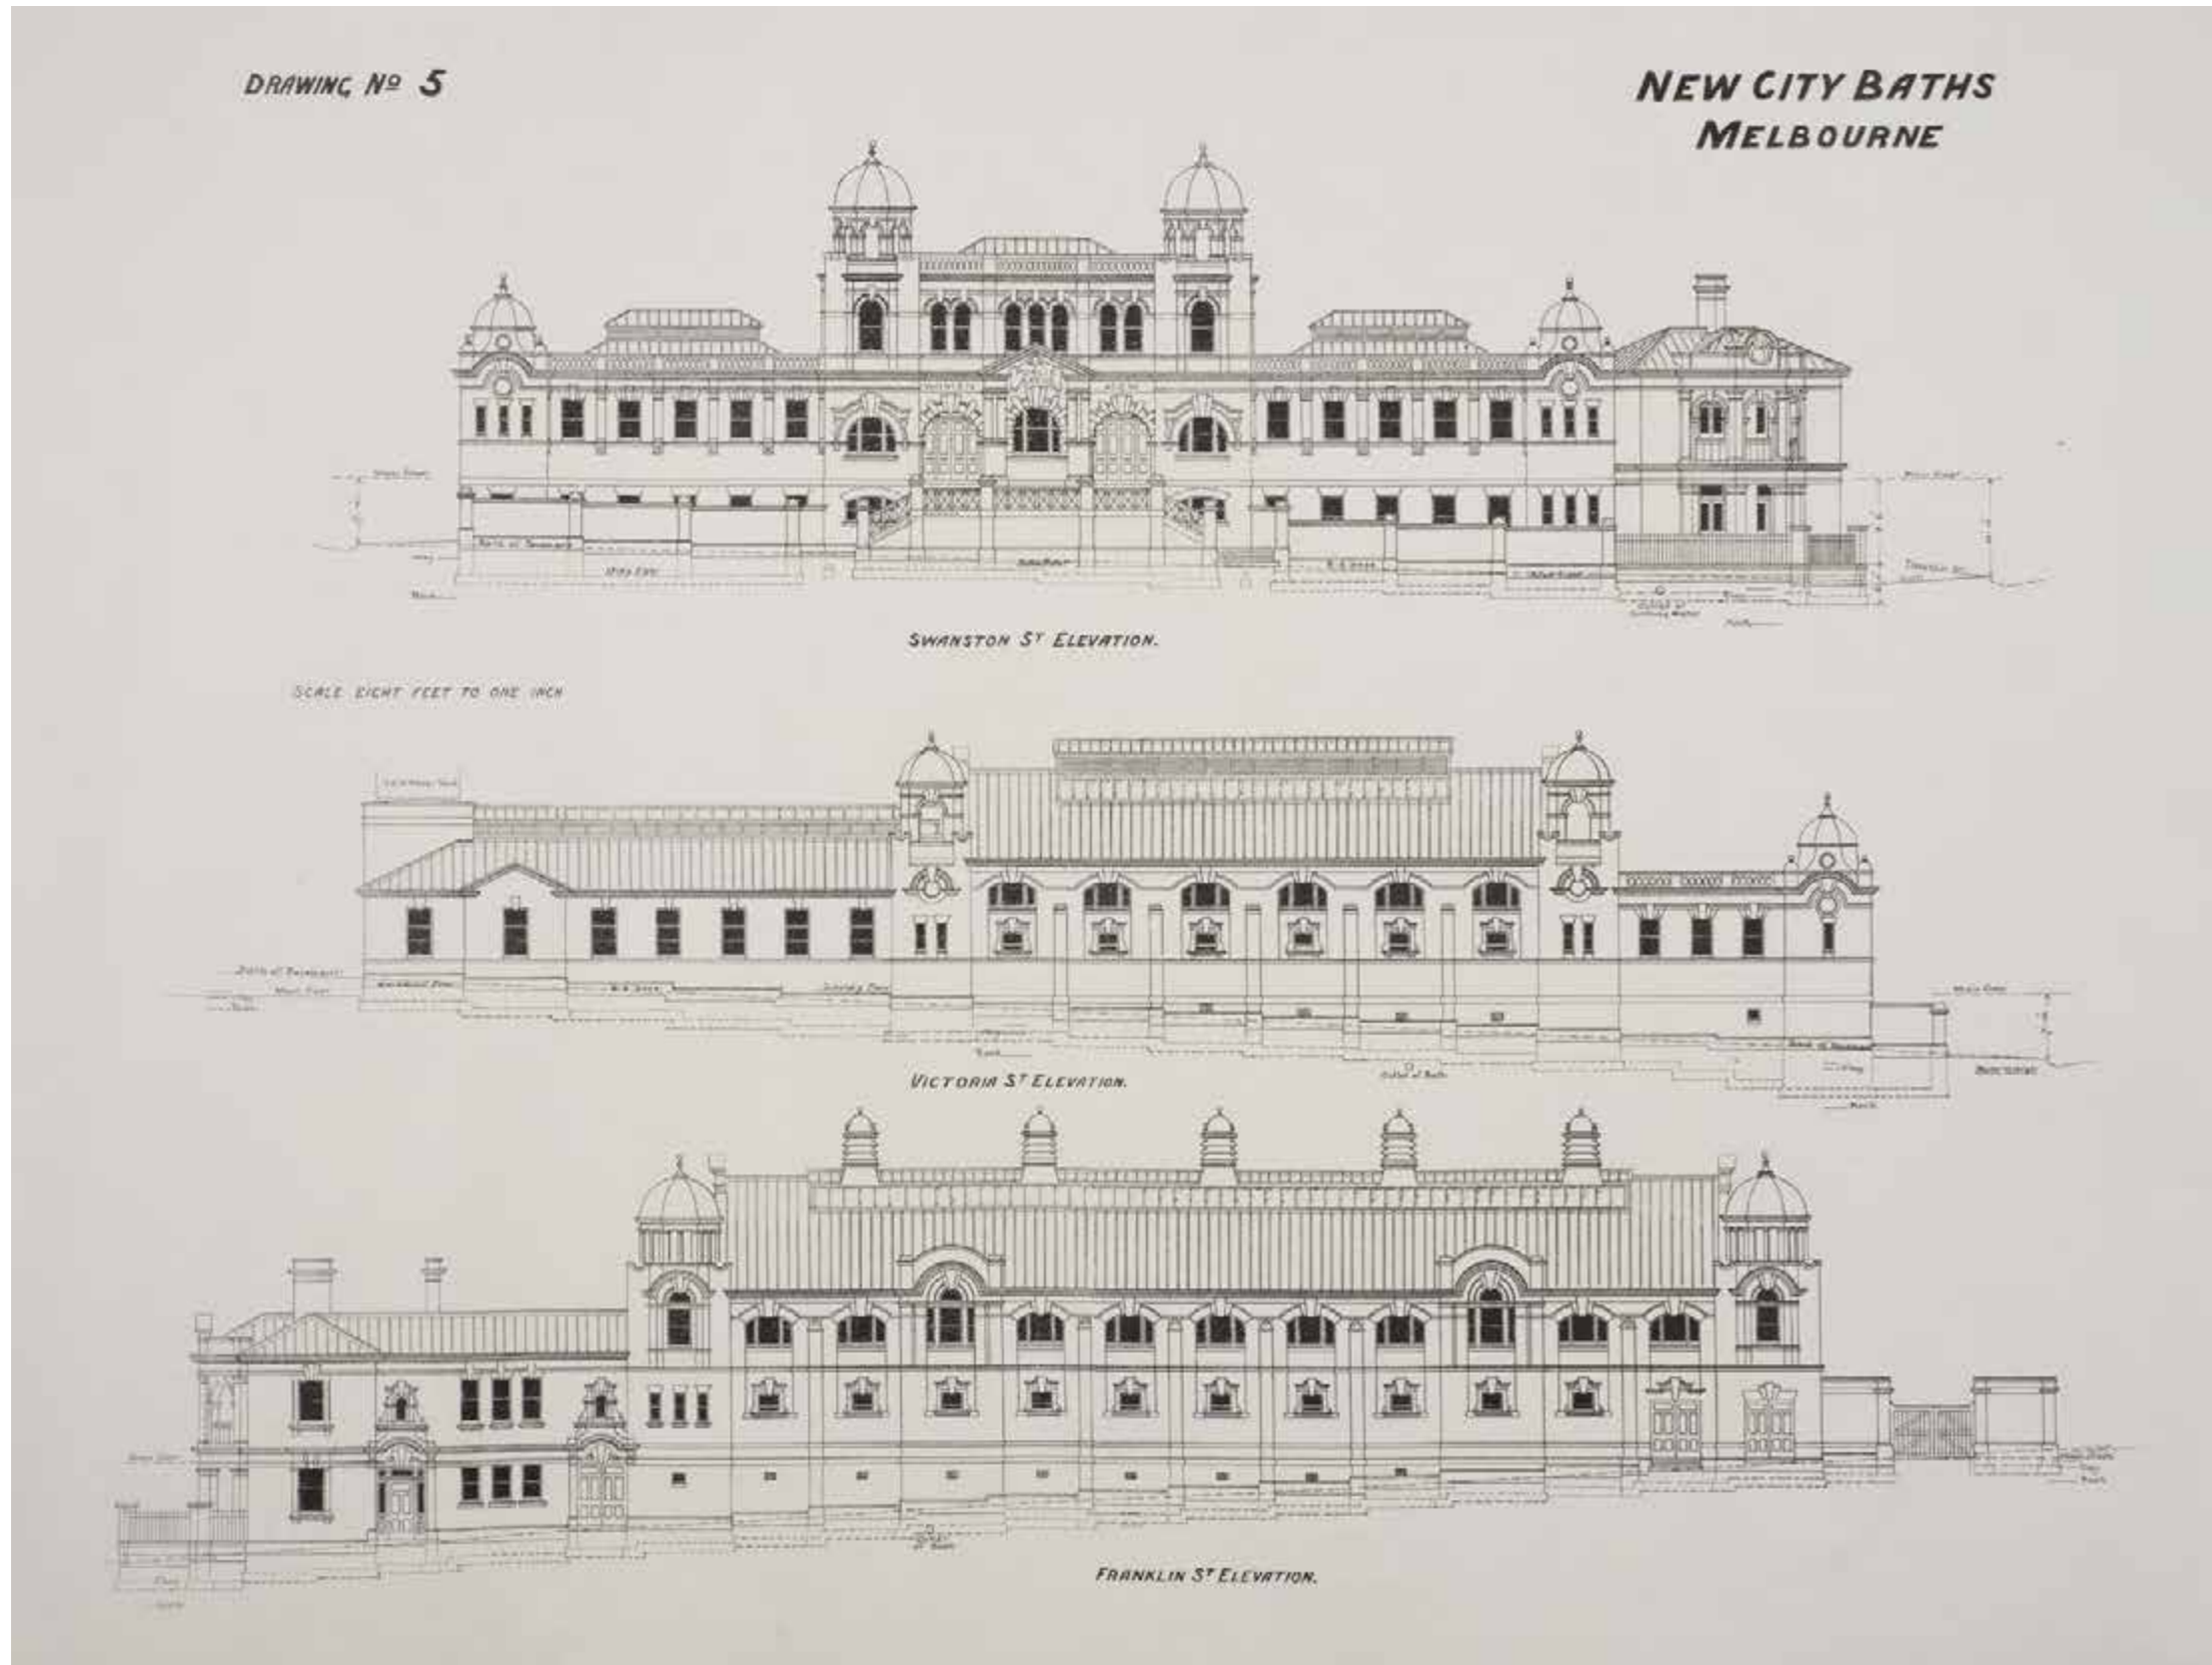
Drawing no. 5, Elevations, New City Baths Melbourne, 1904
